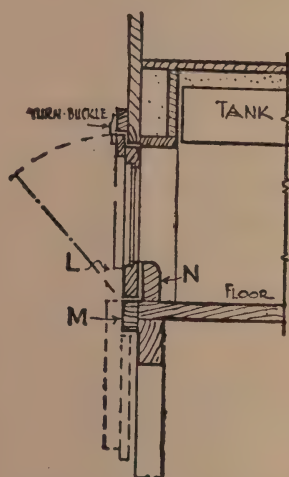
Detail Section of Rearer through Door to Sleeping Chamber
